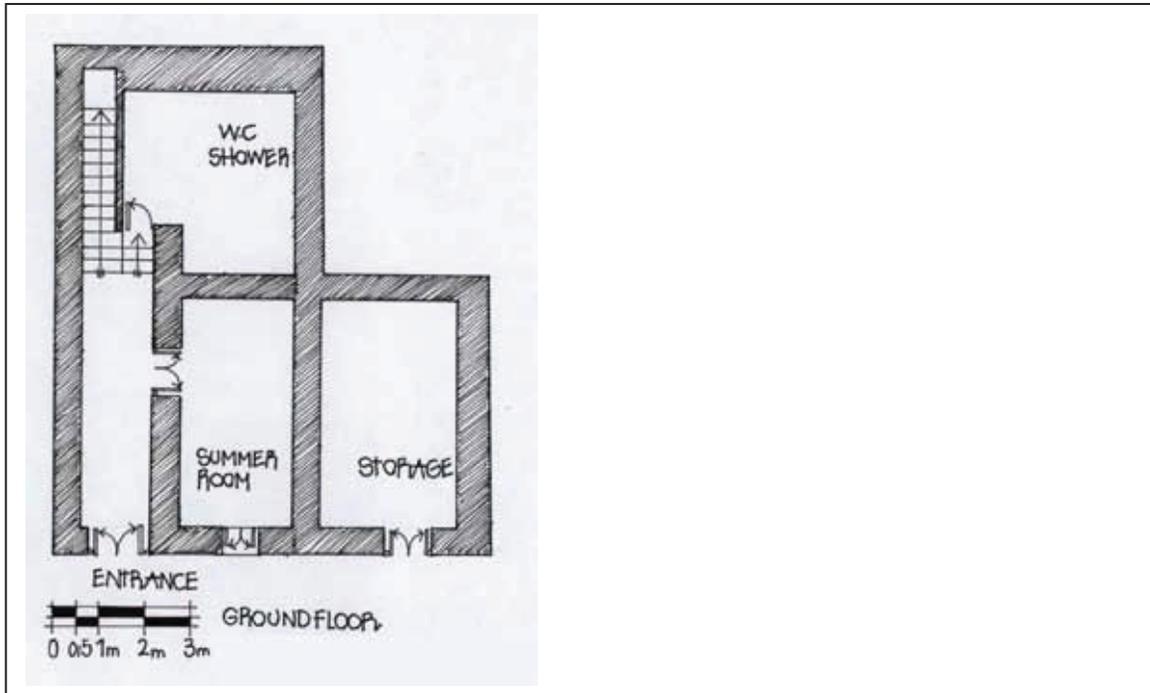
Ground floor plan of Ibrahim Hashimi Khah's house. Drawing by author, 2013.
